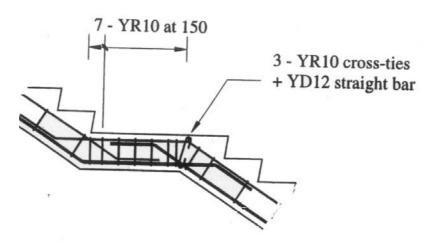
Transverse reinforcement to resist bursting at the knee of a landing
